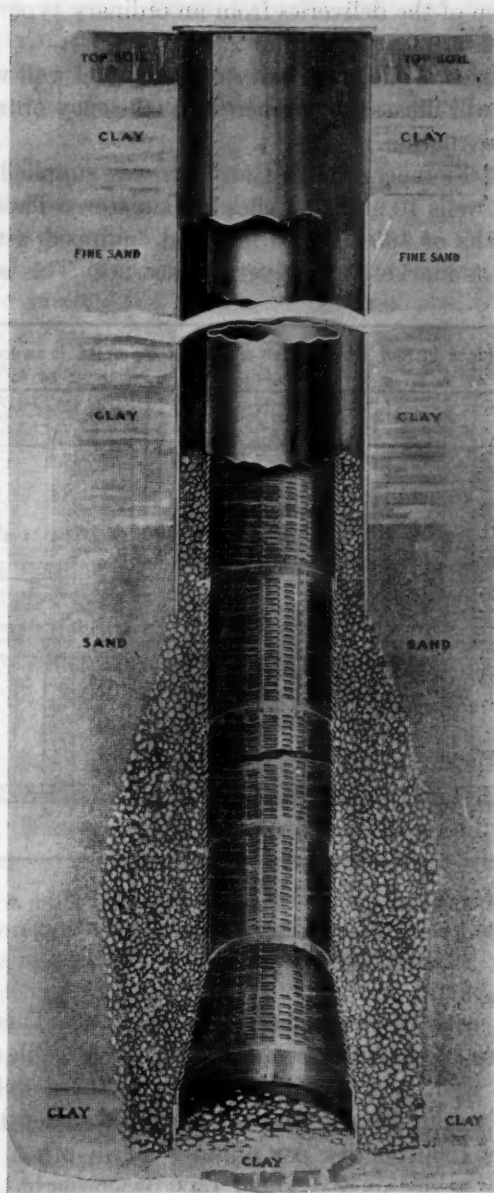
TYPICAL SECTION SHOWING GRAVEL WALL WELL
